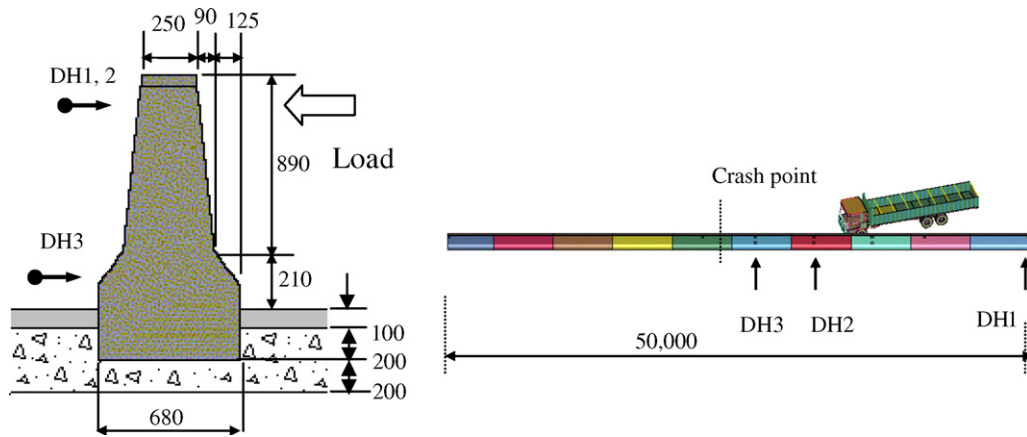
The F shape concrete barrier used for the on-site full-scale crash test (mm).
